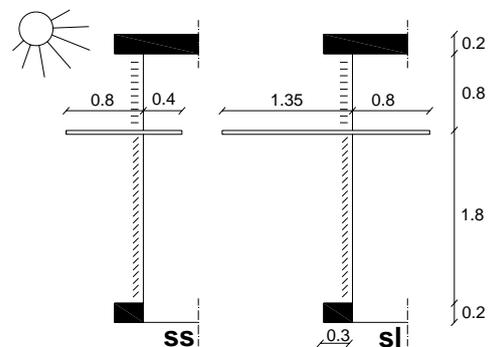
Office sections: light shelf short (ss) and light shelf long (sl)
